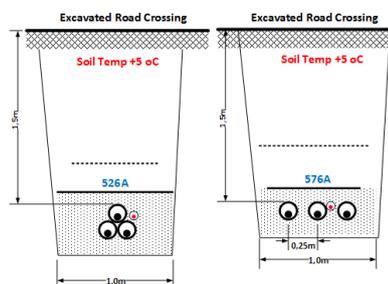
Option 1 – Base Case Cable Trenches Road Crossings
